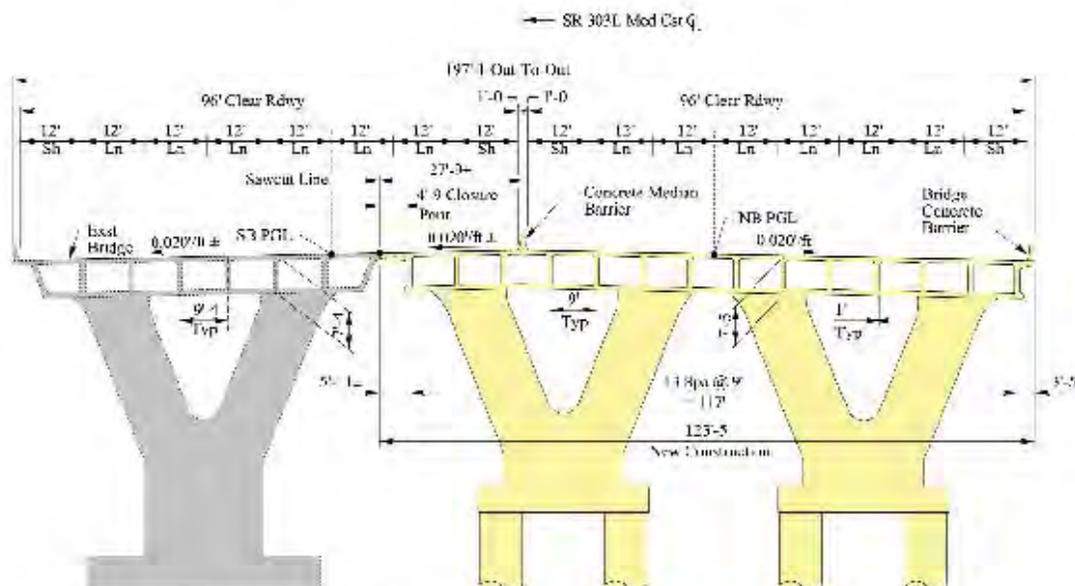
Typical Section at CIP Box Girder Pier Tables
